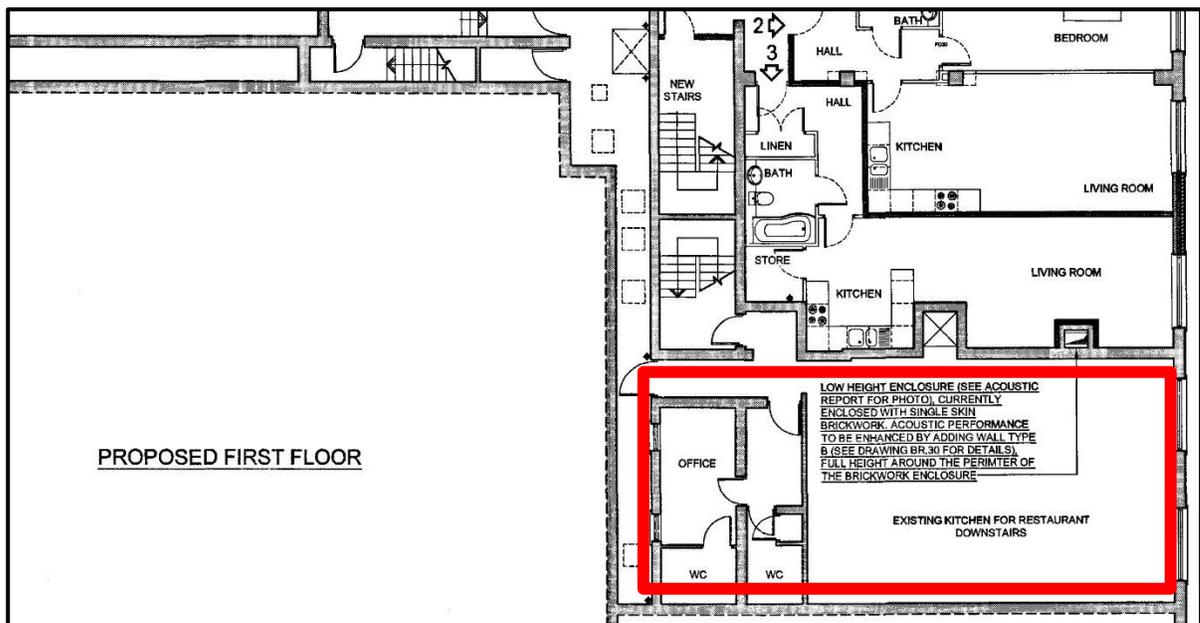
Extract of proposed first floor plan from application F-02250-11
